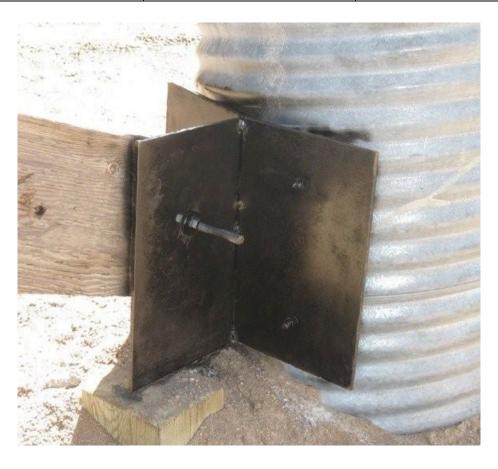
(G)-4 Photo of Timber Pile Repair and Bracing Connection
